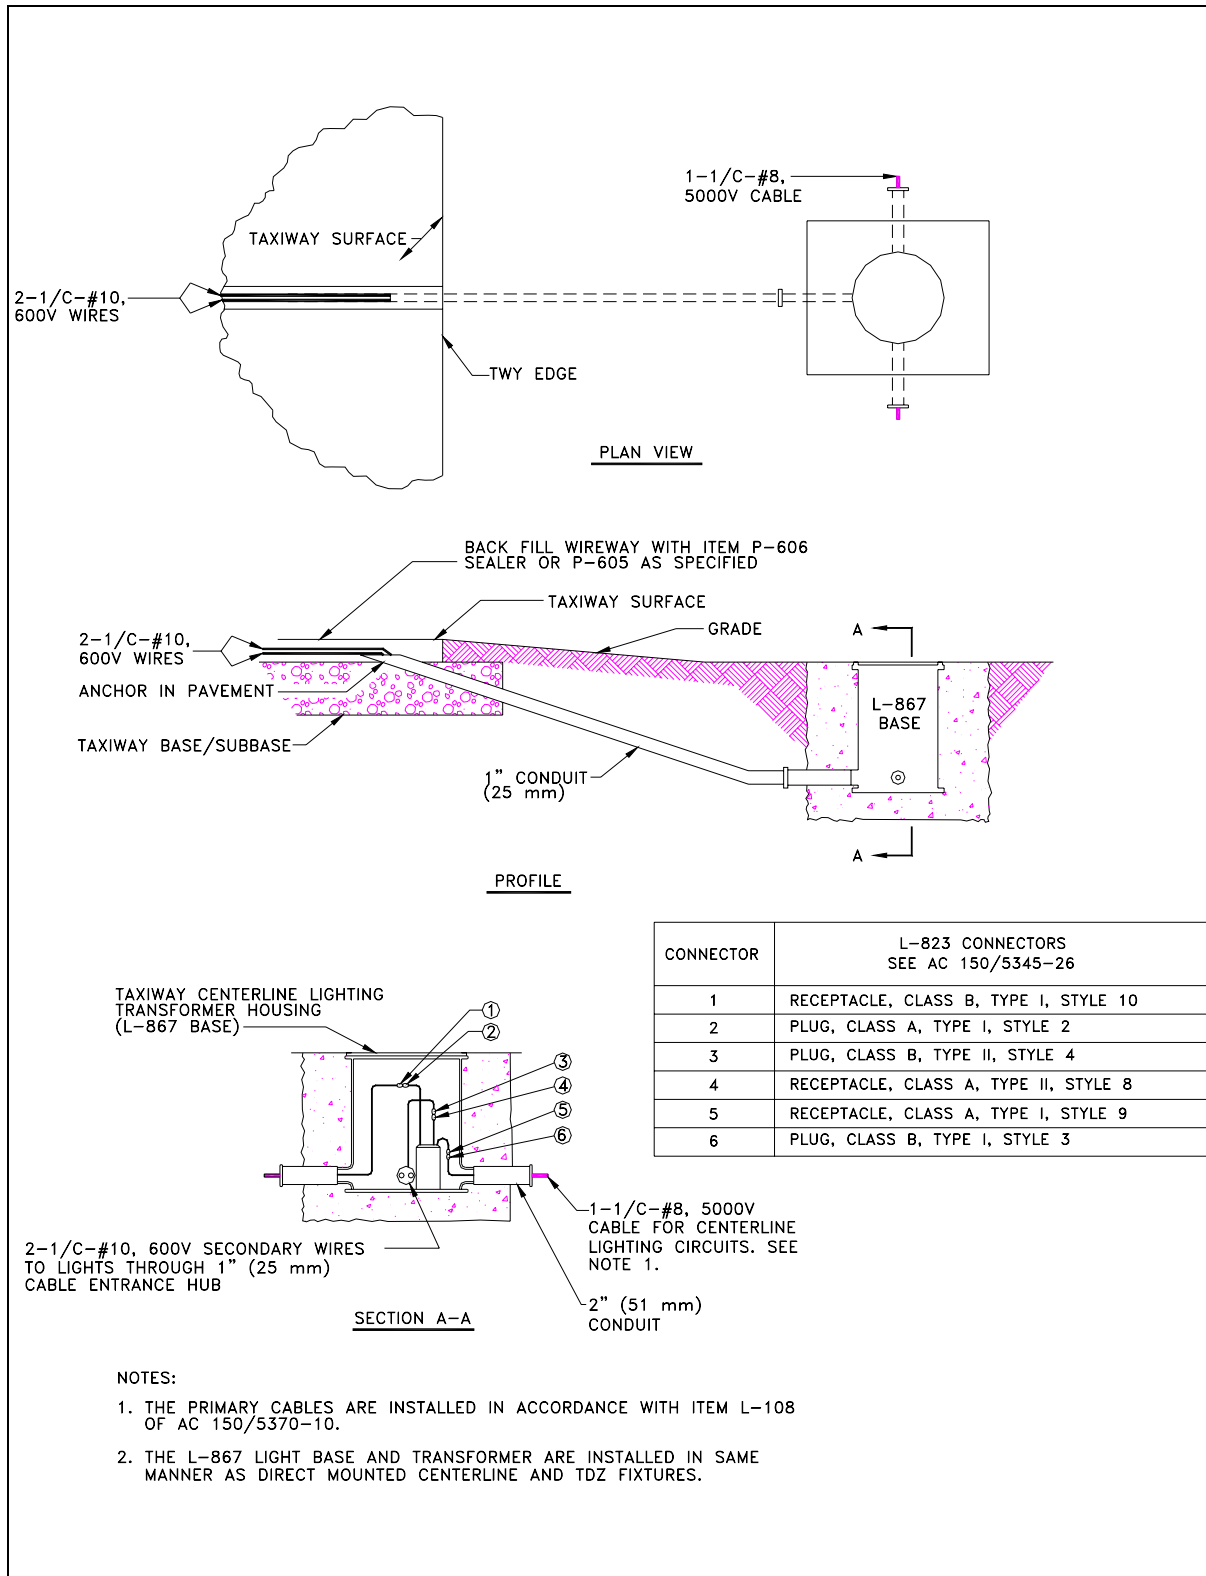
Typical Transformer Housing and Conduit Installation Details for Taxiway Centerline Lights.
